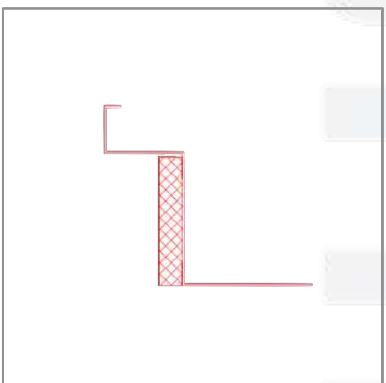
Thermo insulated base and non-thermo insulated horizontal end flange
